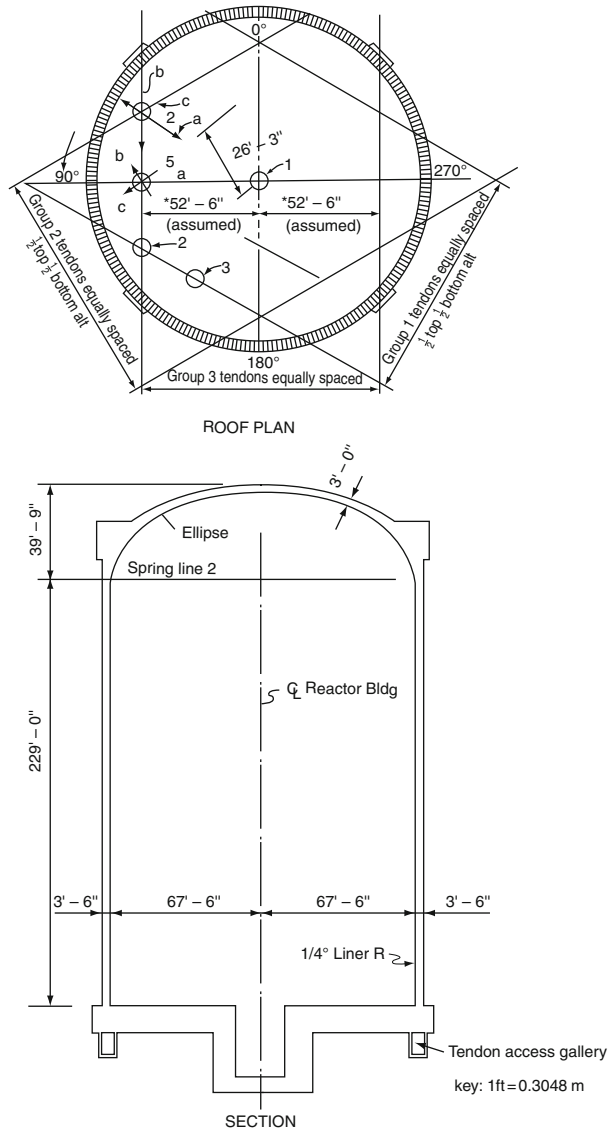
1 Plan of the dome prestressing layout and elevations
